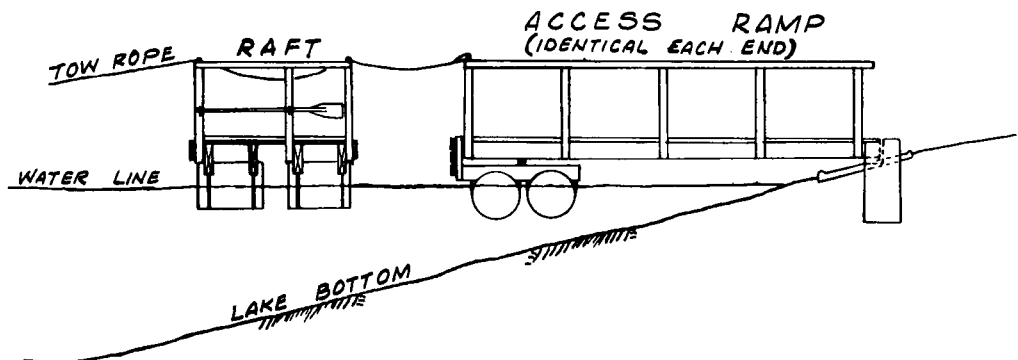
FERRY RAFT AND ACCESS RAMP AT PARK
